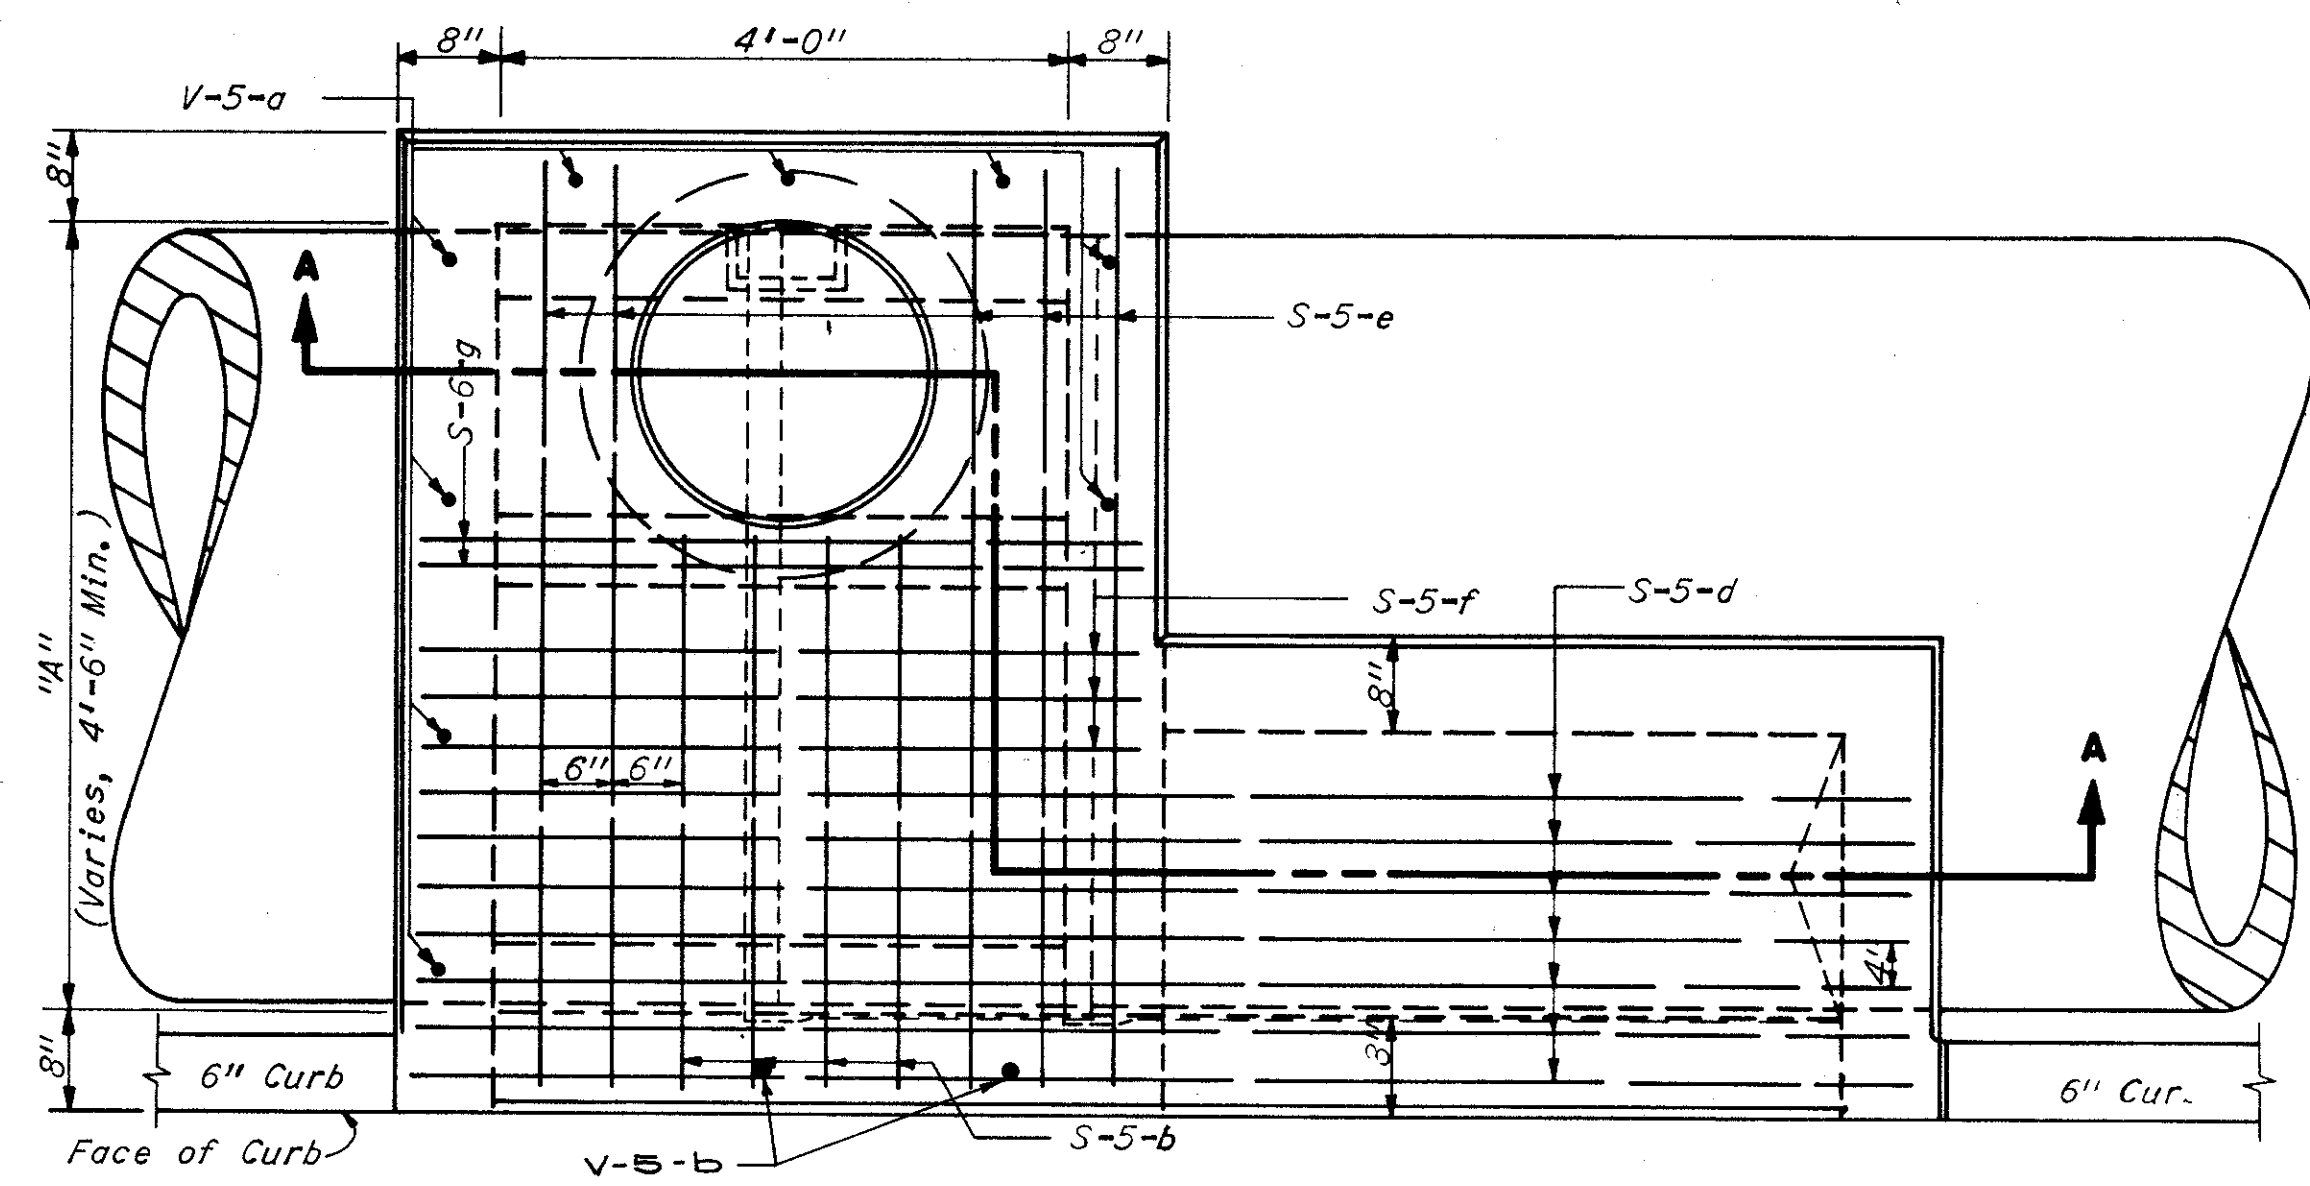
DETAIL PIPE BULKHEAD DRAINAGE DETAILS
